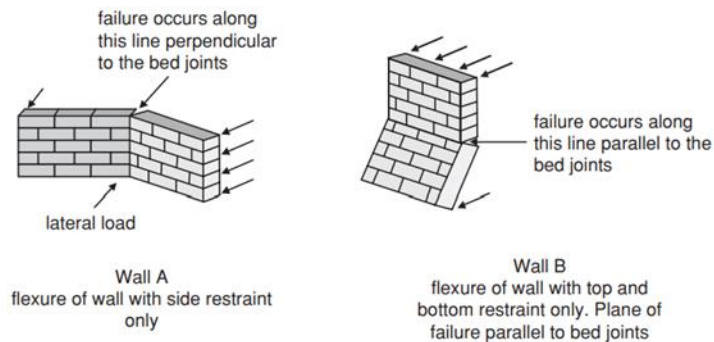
Critical failure planes of laterally loaded masonry wall panels (Curtin et al., 2006).
